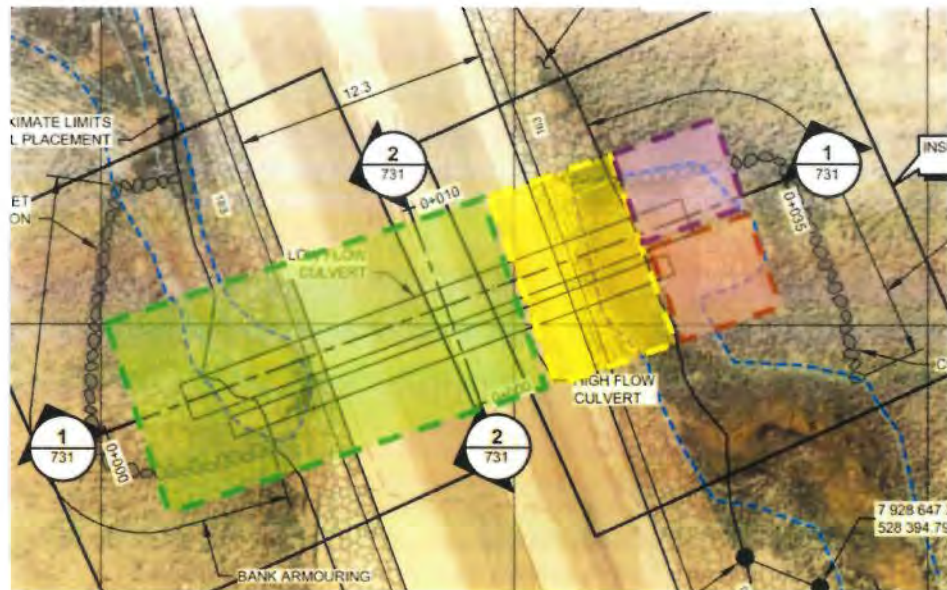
Approximate Foundation Acceptance Area, Plan View. Section 1 highlighted in green, Section 2 highlighted in yellow, Section 3 highlighted in purple, Section 4 highlighted in orange.
